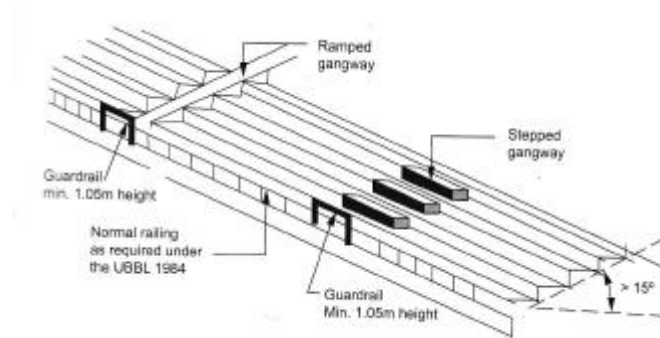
Guardrail at foot of gangway. Source: Guide to Fire Protection in Malaysia Book
